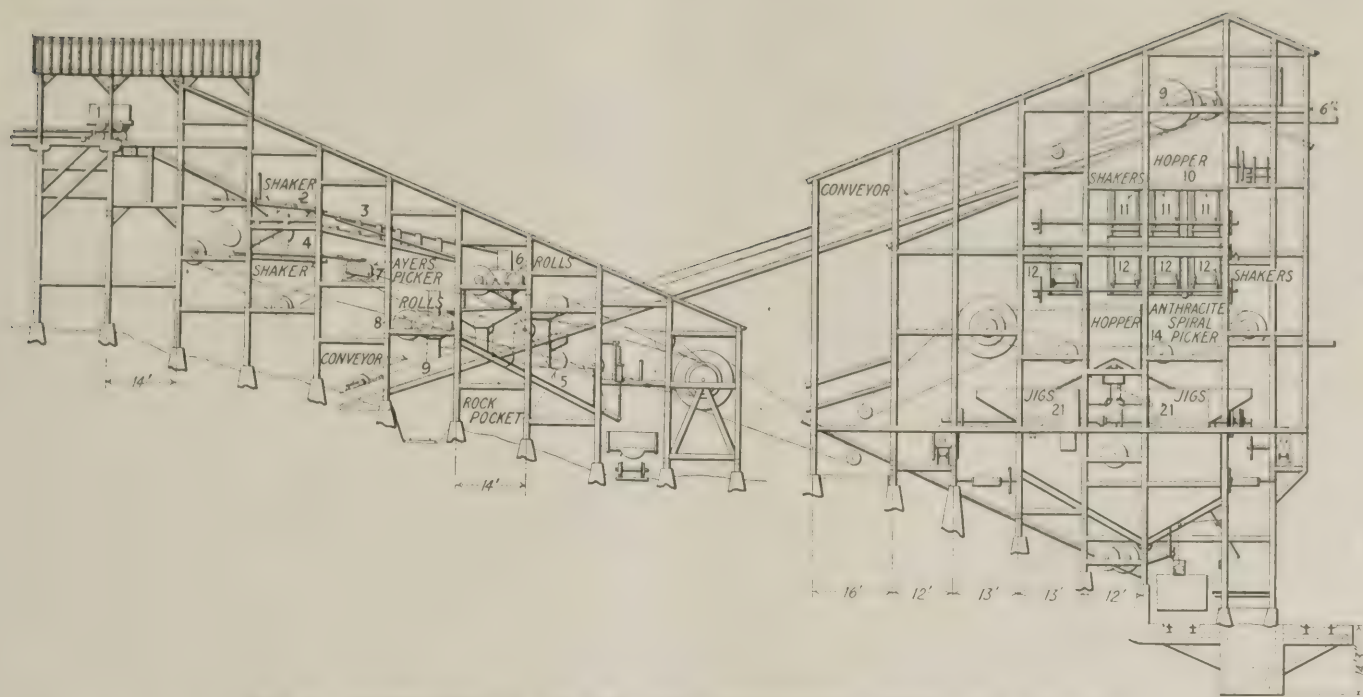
CROSS-SECTION OF THE ROCK-SEPARATOR HOUSE AND BREAKER
